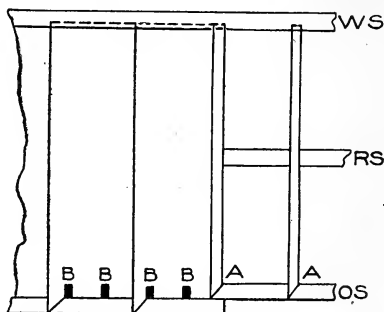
Plan of Part of Stair Shown in Fig. 25.
